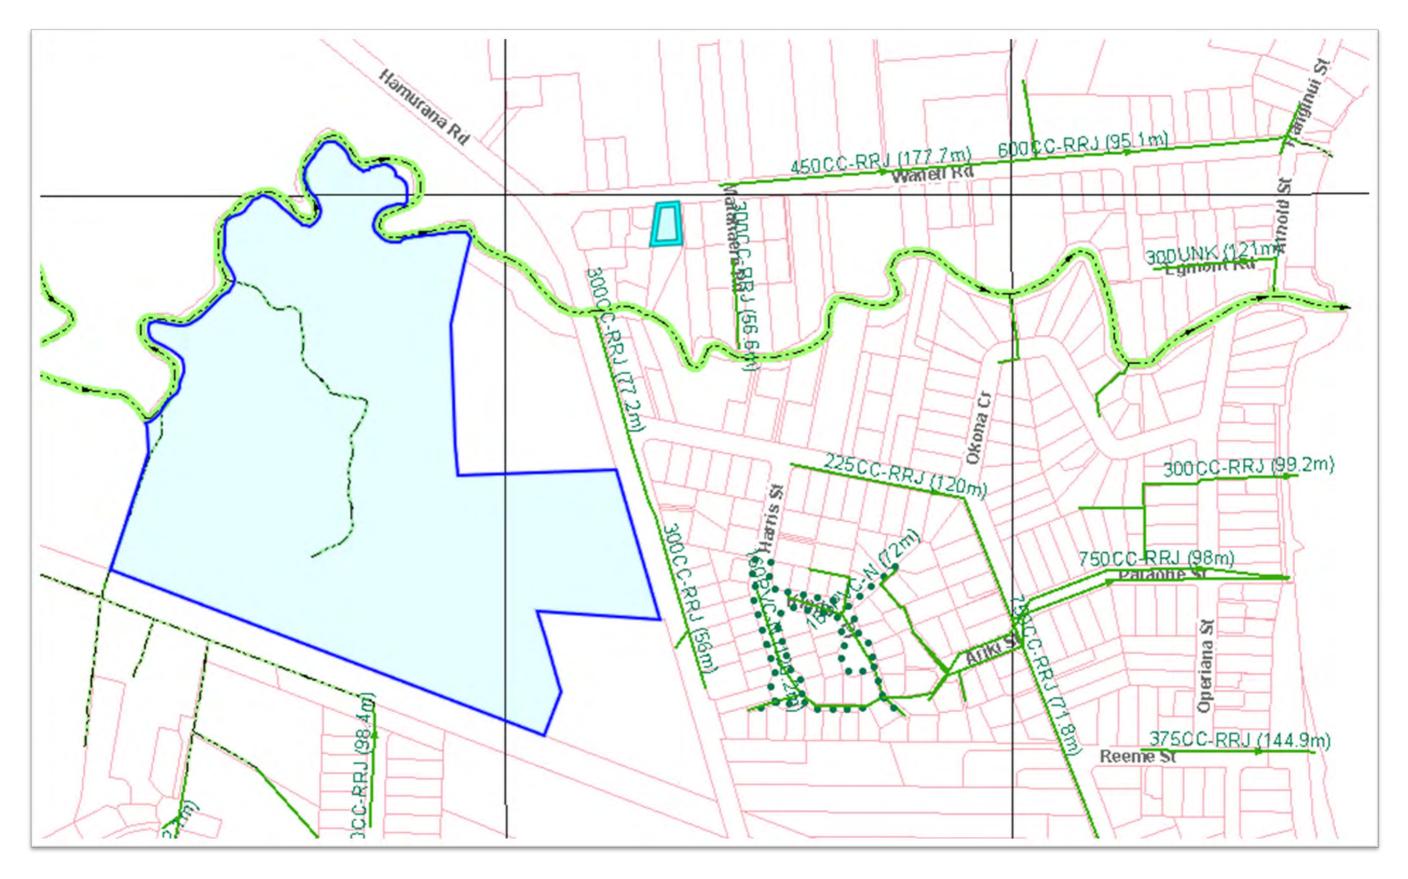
B: Proposed discharge to the existing RLC Road Drainage System on Ngongotahā Road (300 mm pipe)
